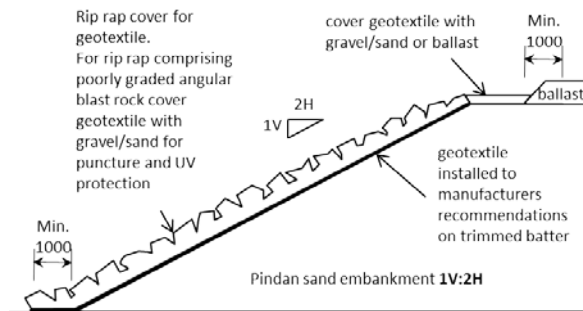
Example detail of recommended geotextile and rip rap protection on erodible embankments.
